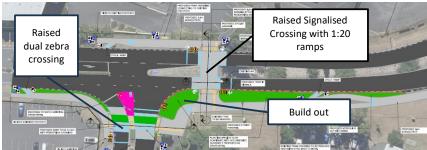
Preferred Option – Signalised Crossing on Raised Safety Platform, a duel RSP and a build out
